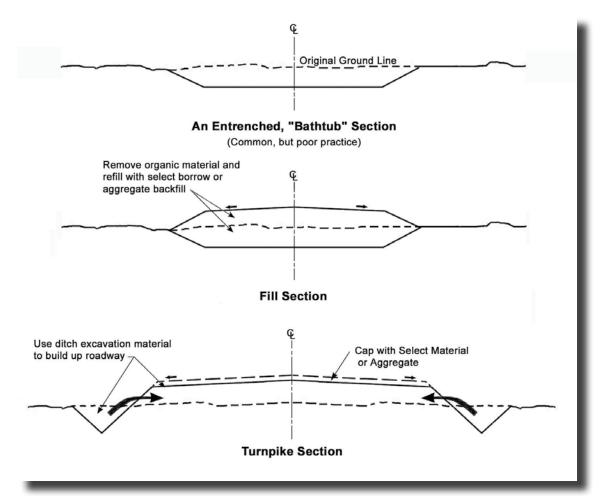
Methods for raising the roadway out of an entrenched bathtub section.
